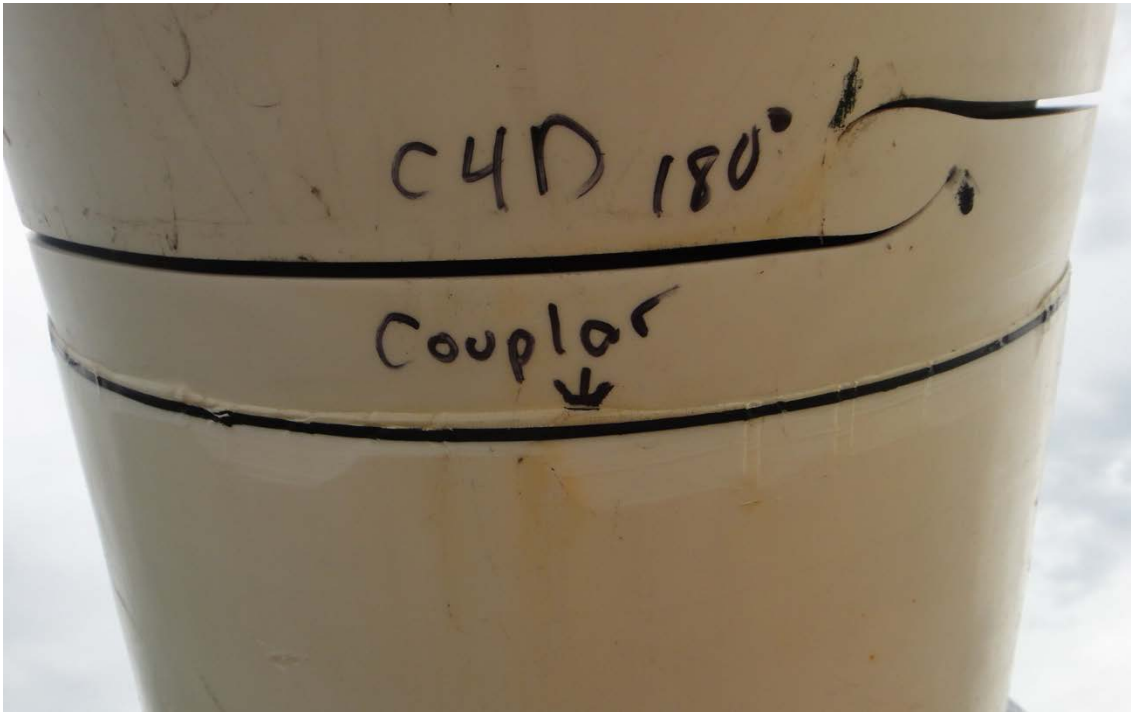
Bottom Side of HDPE Reducer Where Cracks Growing Clockwise and Counter-Clockwise from the Top Side Terminate.
